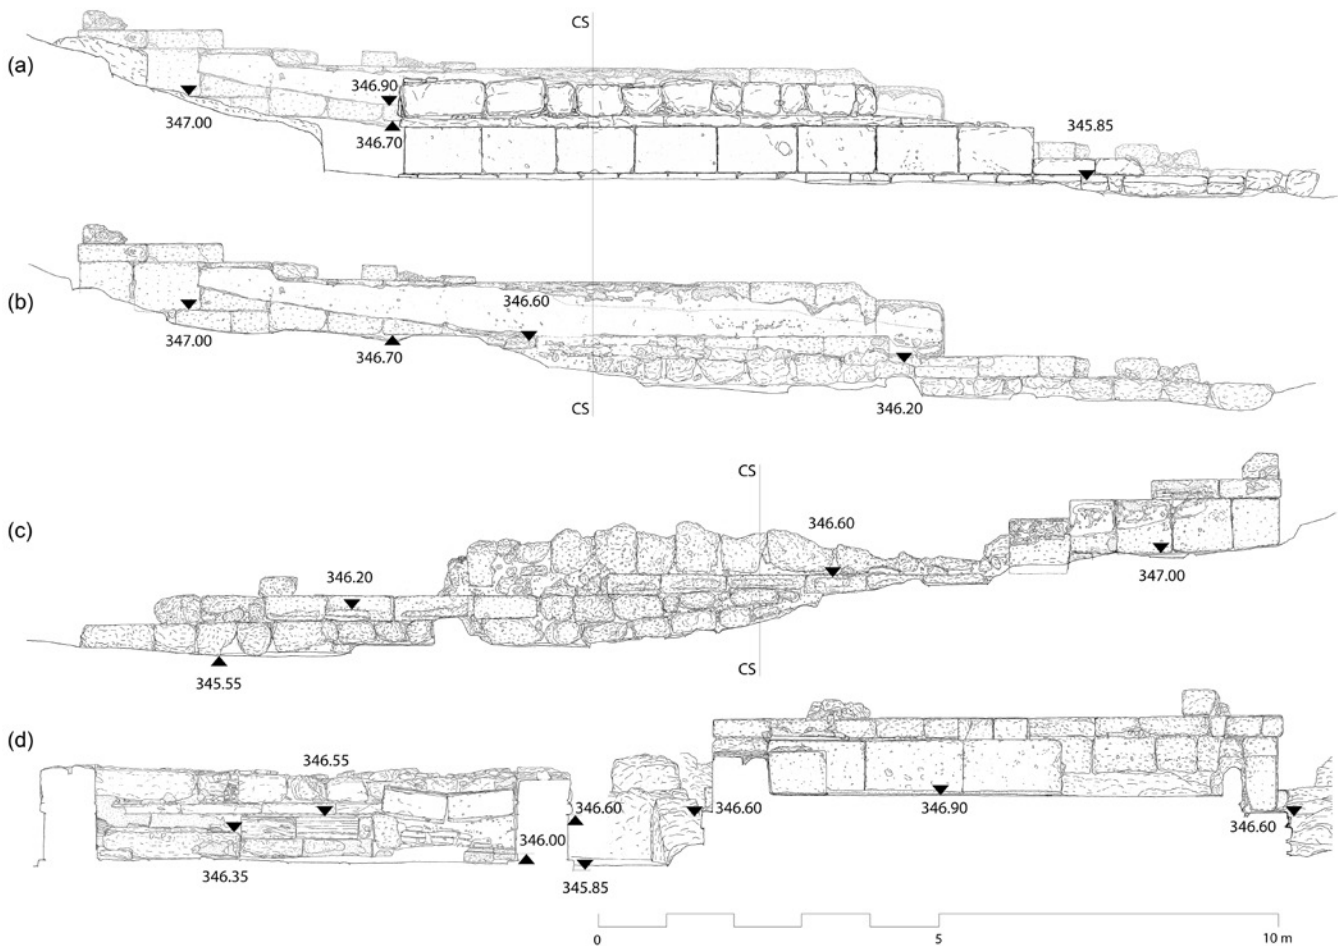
(a) South elevation of Building E in front of Building D; (b) south elevation of Building D; (c) north elevation of Building D; (d) cross section of Buildings D and E towards west
